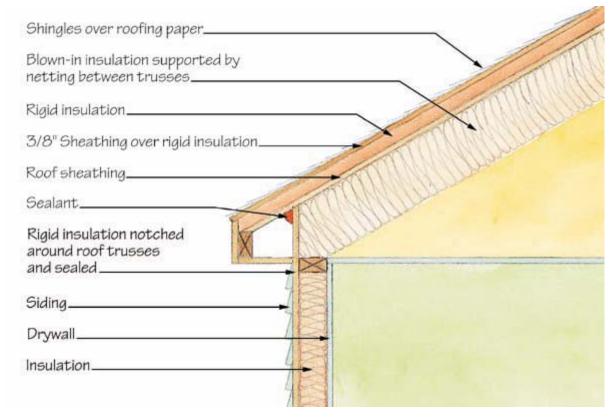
Insulation and Sealing of Cathedralized Attic Roof
